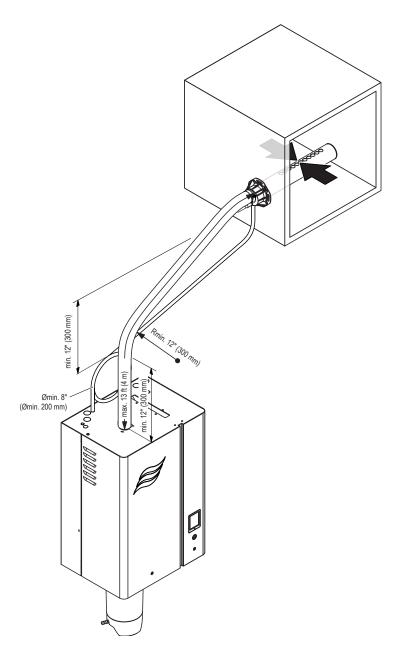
Steam distributor mounted more than 20" (500 mm) above the top edge of the humidifier
